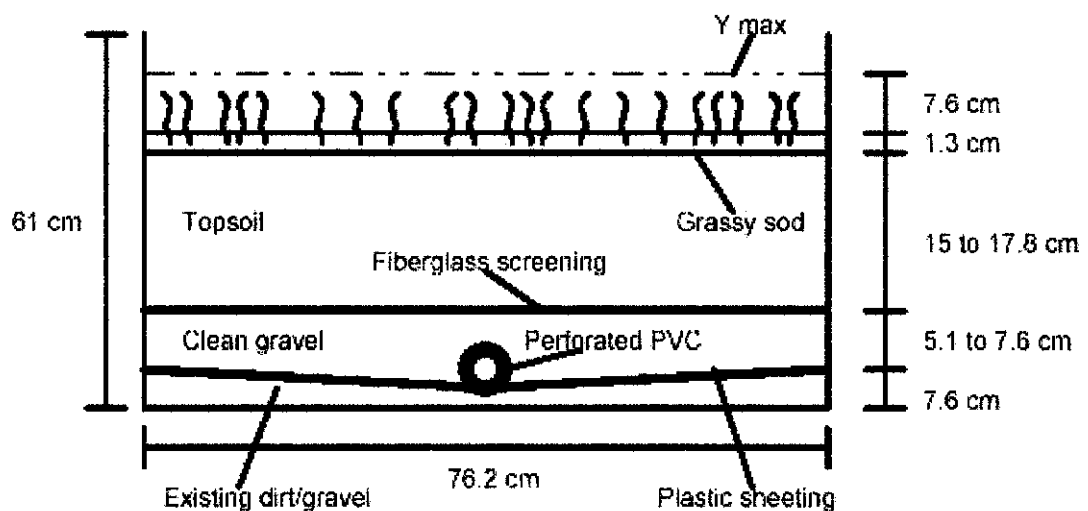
Side view of constructed vegetative swale in a flume (Patrick M. Walsh et al.)
